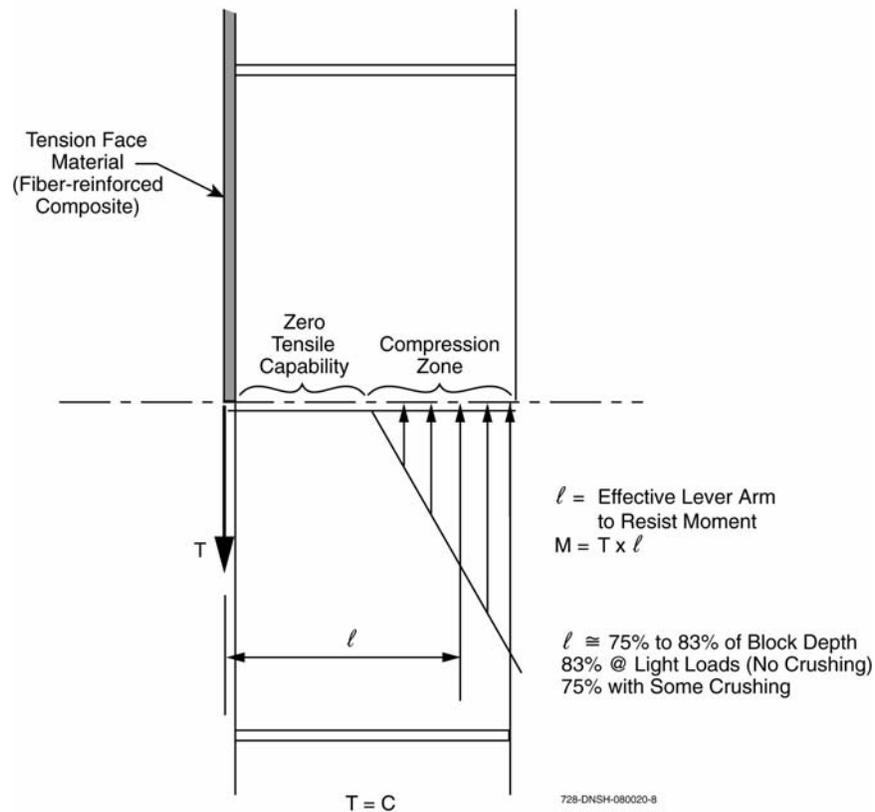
Creation of bending resistant block wall using tension-side composite fiber-reinforced layer
